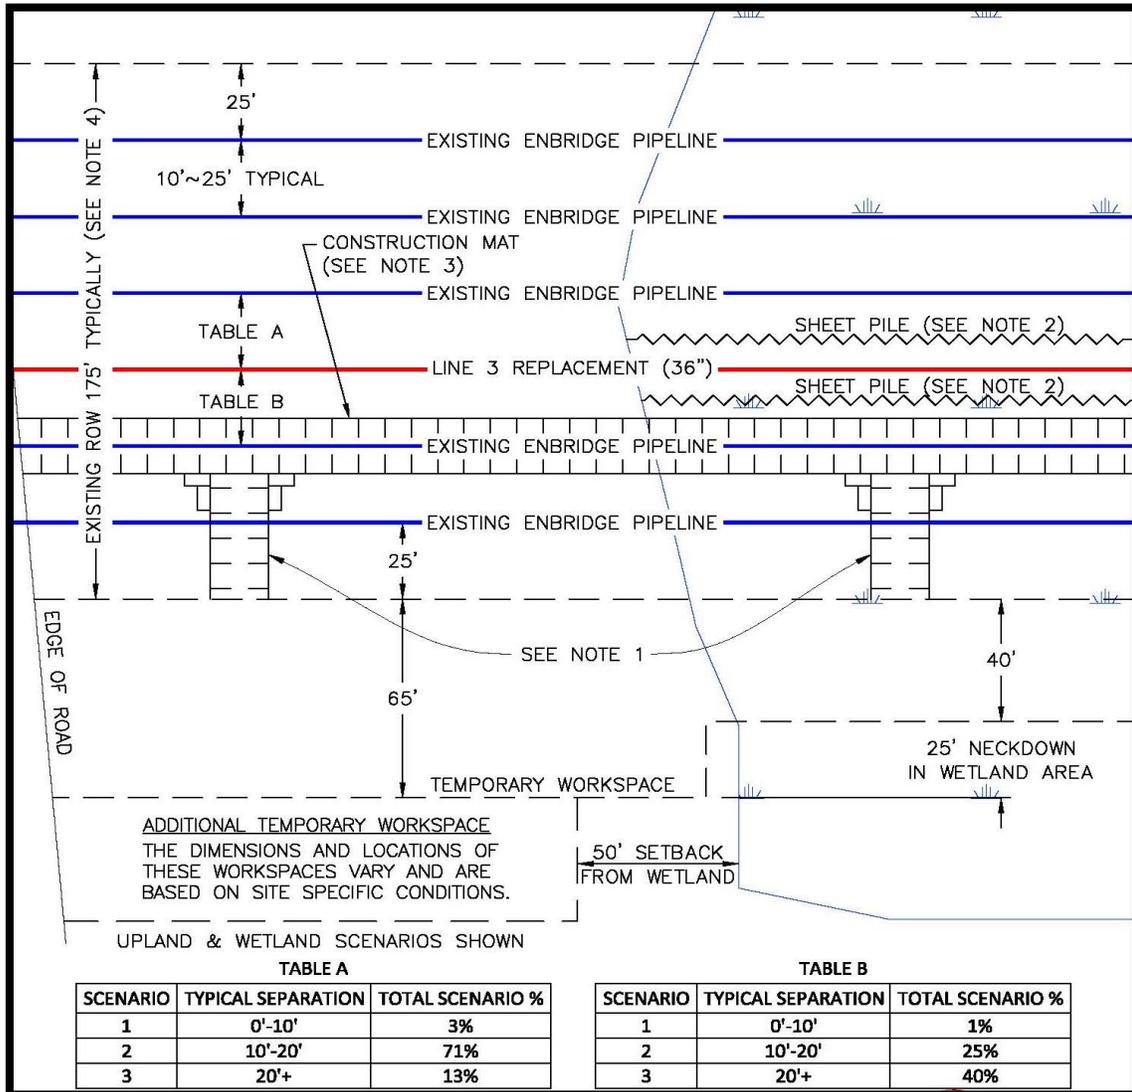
shows the typical construction footprint where the construction work activities would be located on the south side of the Enbridge Mainline right-of-way. The land requirements would be as follows: Uplands: 240 feet in total, using 175 feet of existing permanent right-of-way and 65 of temporary workspace area; and Wetlands: 215 feet in total, using 175 feet of existing permanent right-of-way and 40 feet of temporary workspace area. (See Appendix I.4.)
